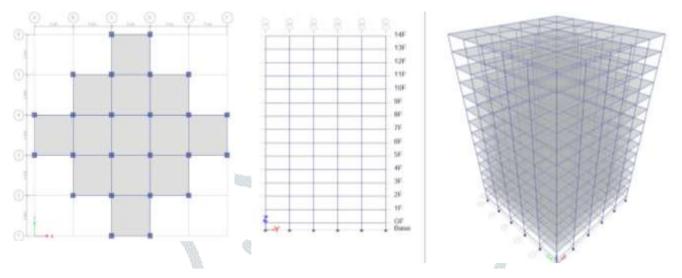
Plan view and elevation and 3D view of Irregular-1 building model
